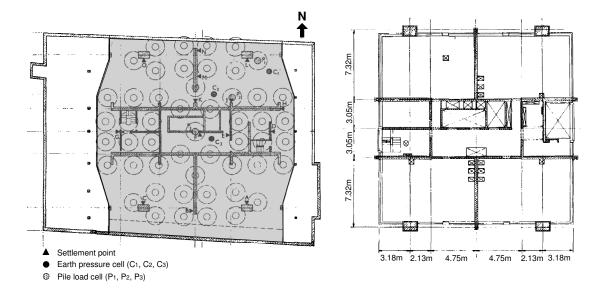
Foundation and superstructure layout of Hyde Park Cavalry Barracks (Hooper 1973)
